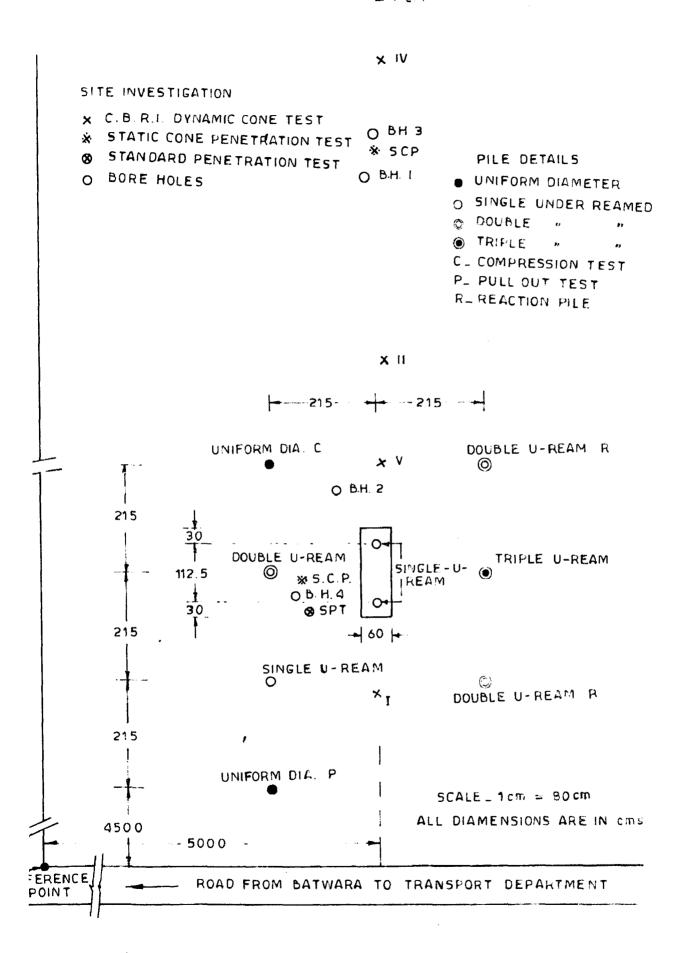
SITE PLAN SHOWING LOCATION OF TESTS
